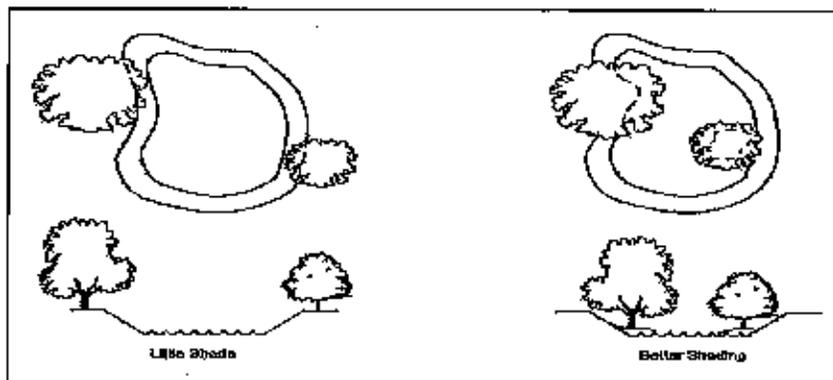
Tree Placement to Shade Pond and Reduce Thermal Impacts
